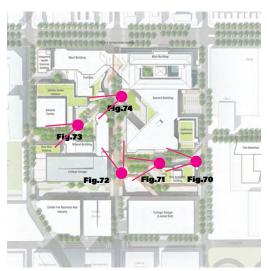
Campus Walk at Mathias Baldwin Park Gateway
